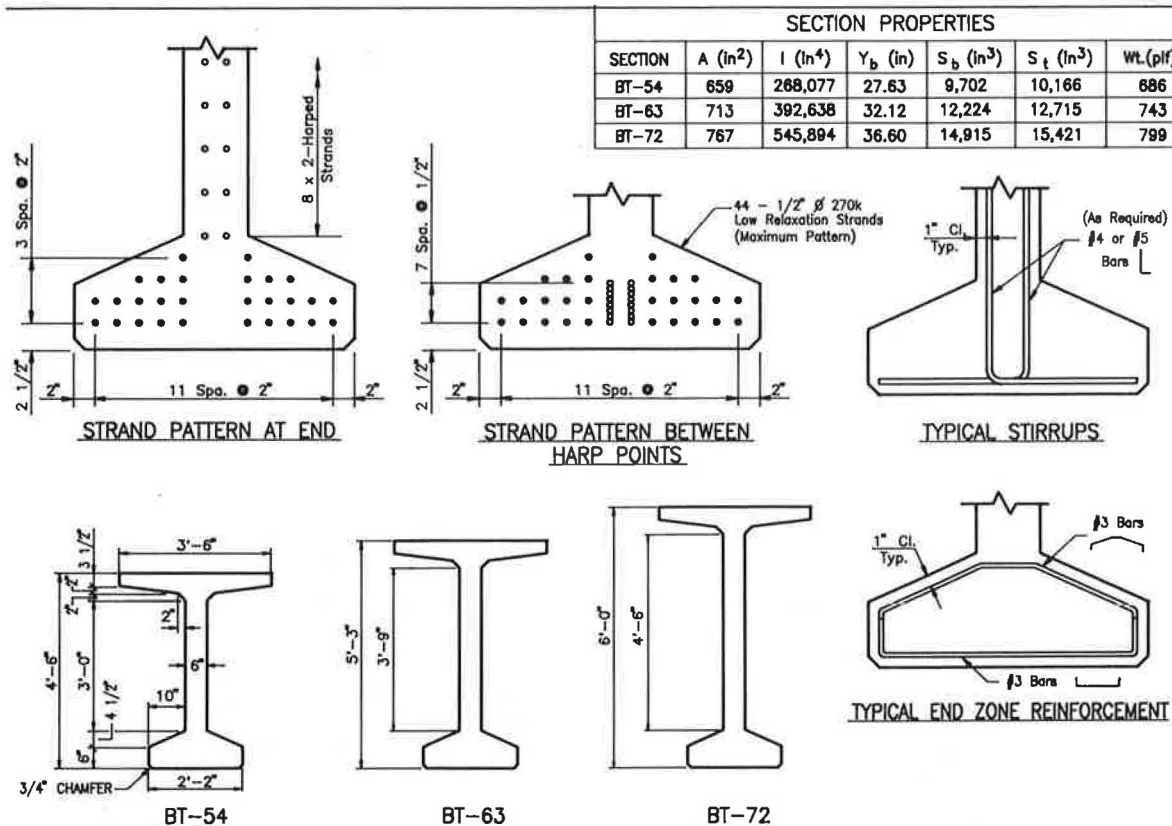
Bulb-T sections recommended by PCI Bridge Committee.
